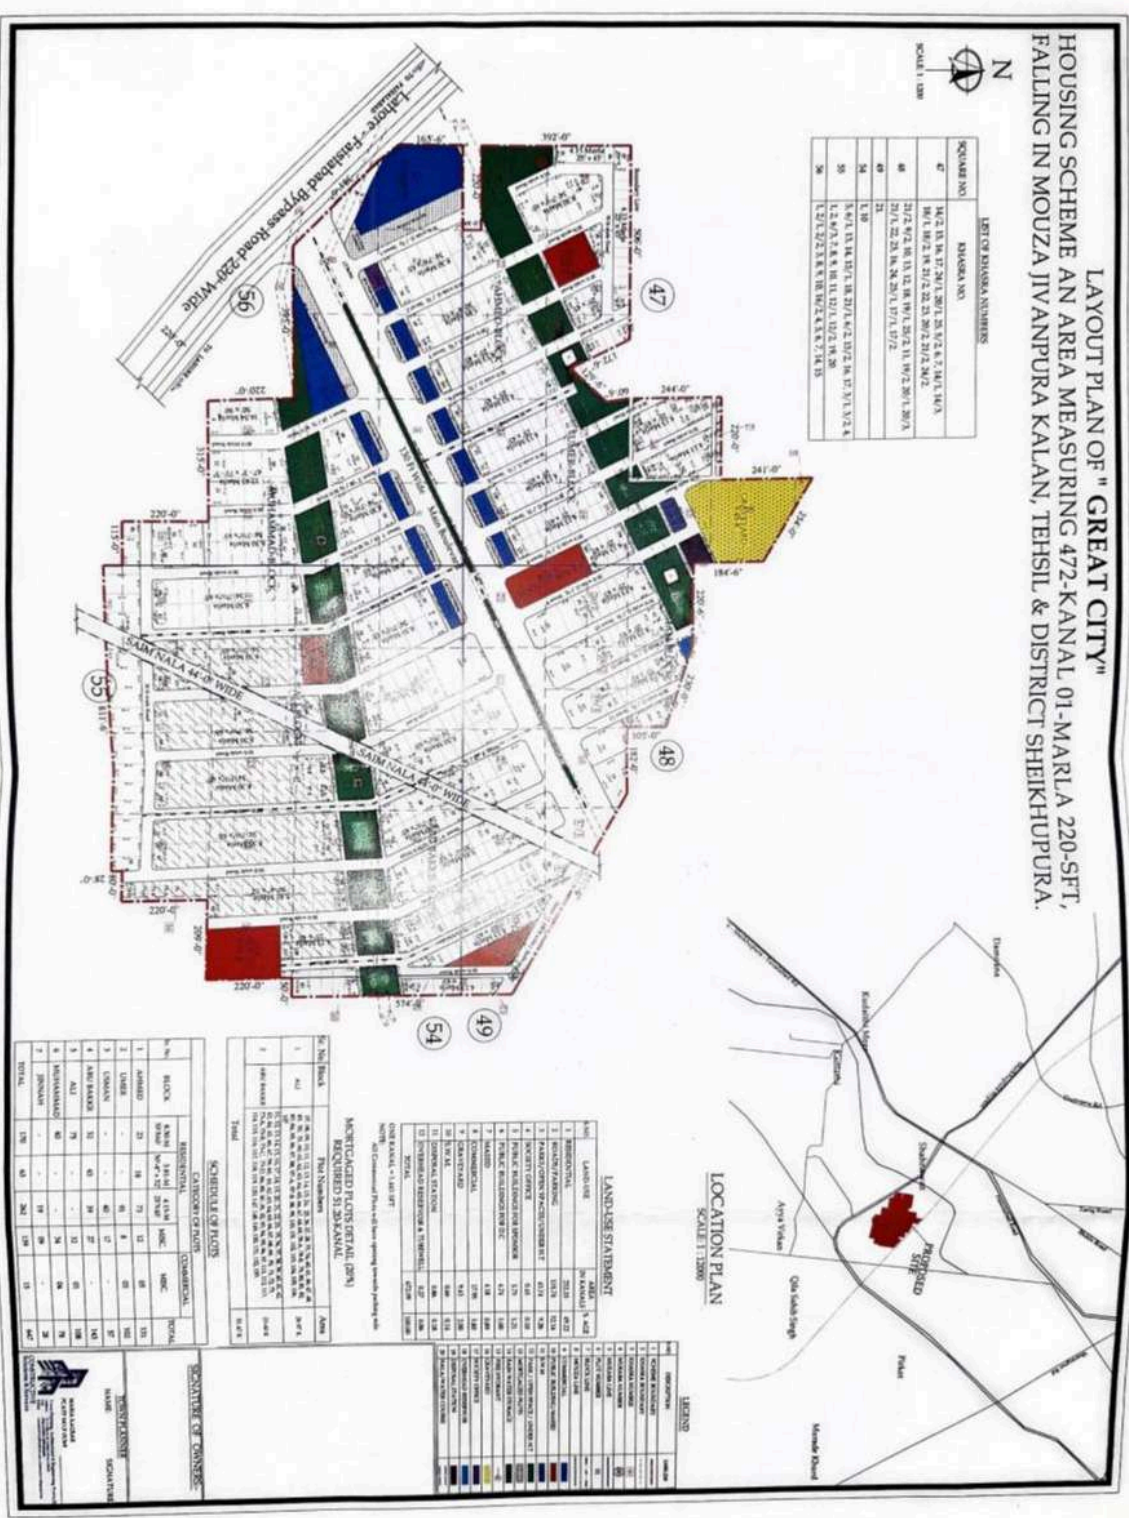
Project Location at Lahore -Faisalabad Road, Bypass Sheikhupura
